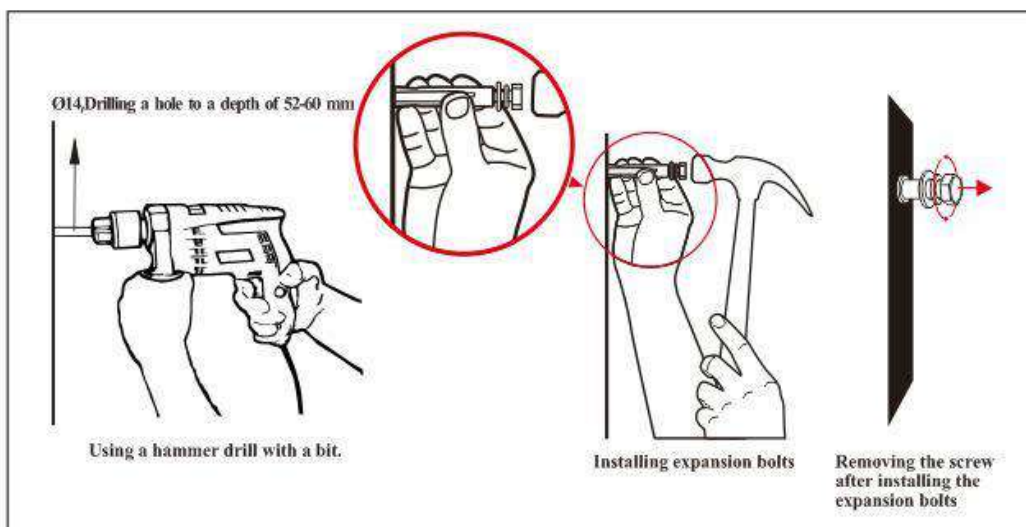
Drilling a hole and installing expansion bolts (unit: mm)
